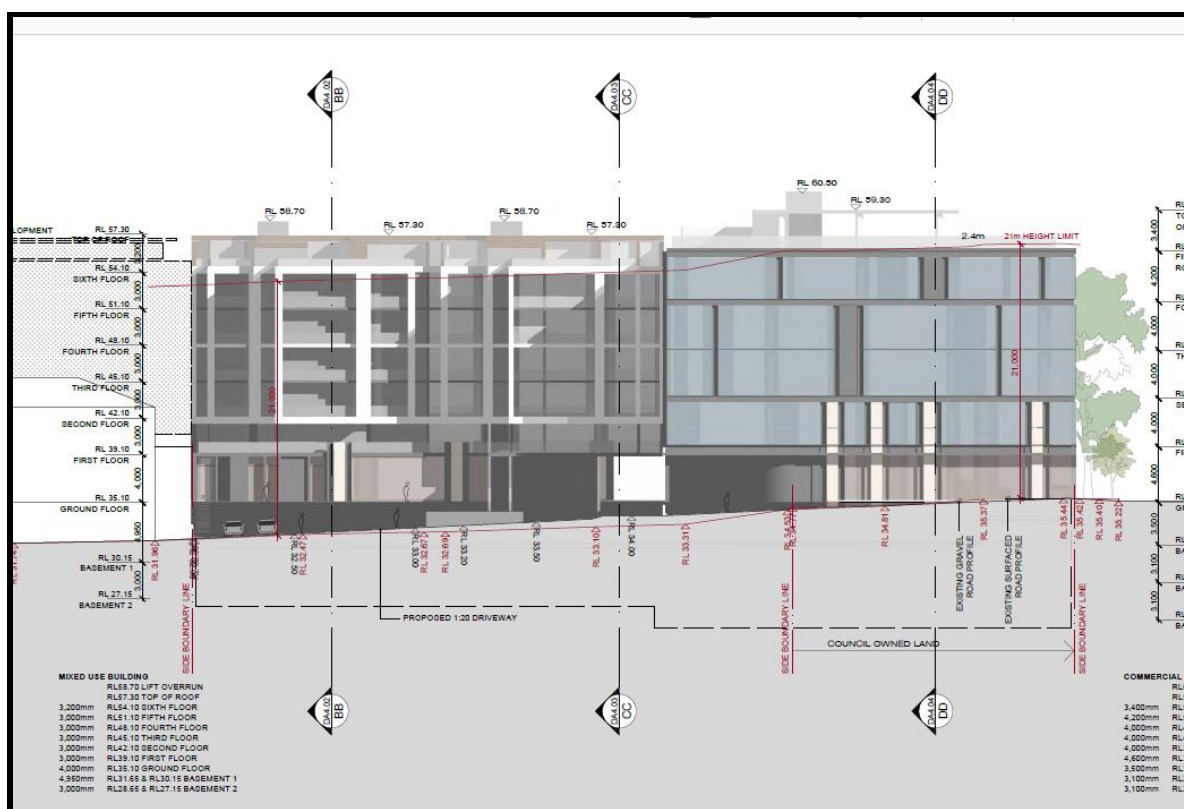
Previous Proposal - Southeast Elevation (Source: Marchese Partners, May 2019)
